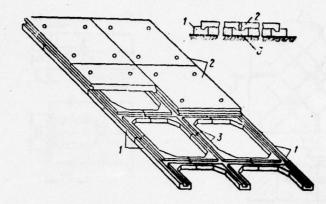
Prefabricated pavement with side foundations and cross pieces. 1-Foundation; 2-Slab; 3-Crosspiece
